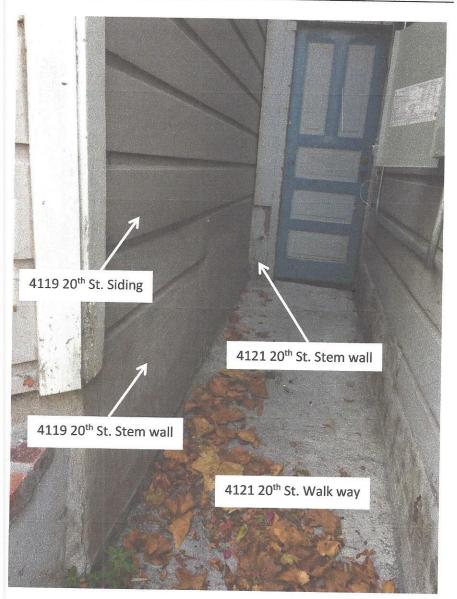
indicates footing is lower than 4121 20th St. Walkway. Proposed basement finish elevation is 2 feet lower than walkway elevation.
